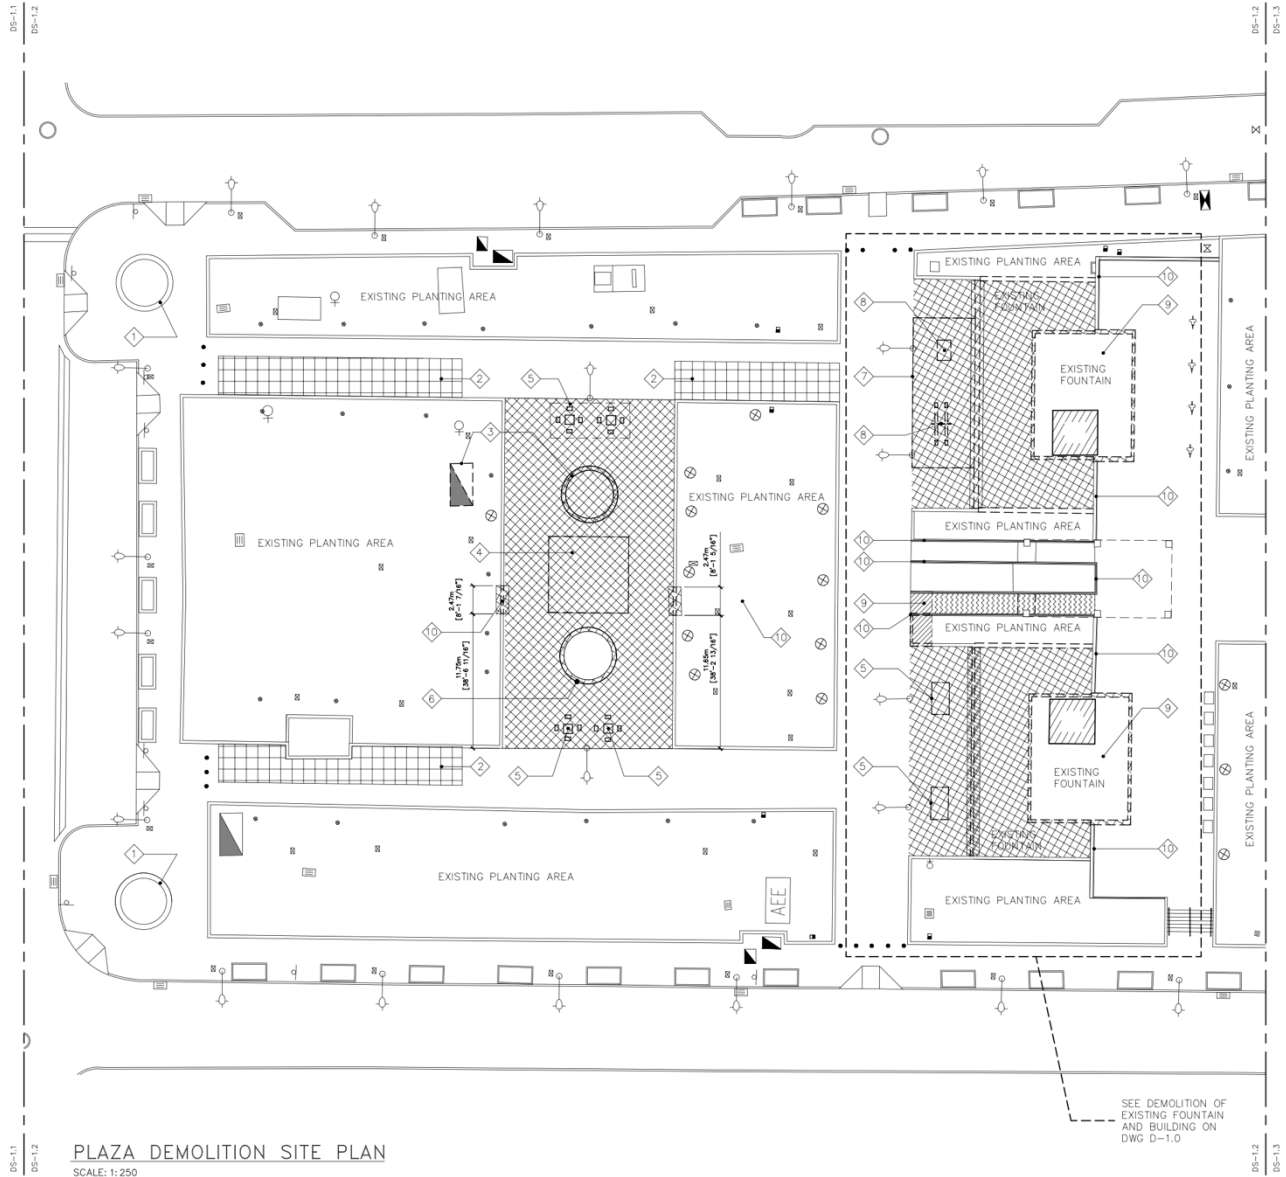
Demolition site plan for the west half of Plaza de la Convalecencia (Source: Drawing DS-1.2, Hernández-Bauzá PSC Architects, 2024).
